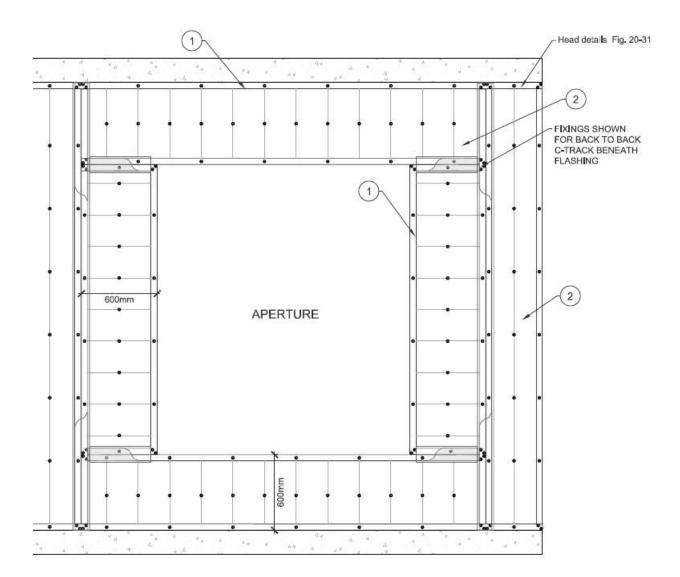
Typical Vertical Speedpanel wall with 600mm maximum vertical and horizontal infill.
